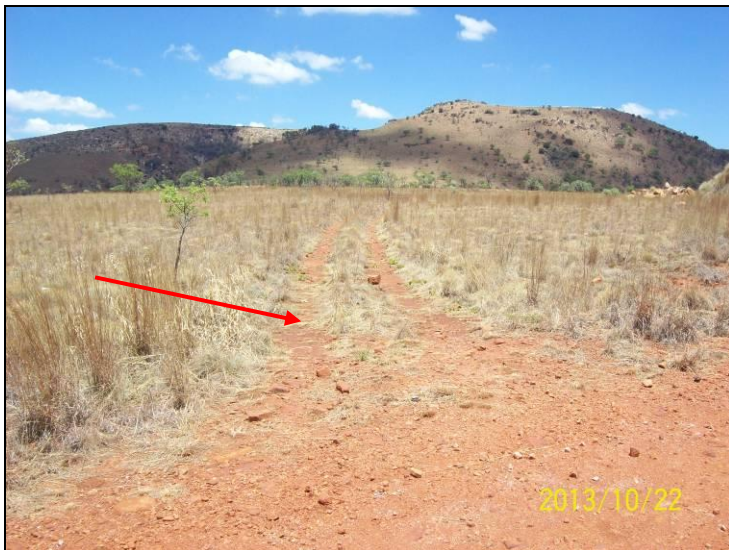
The existing narrow access gravel road to the proposed 1ML Reservoir and pump station development site
